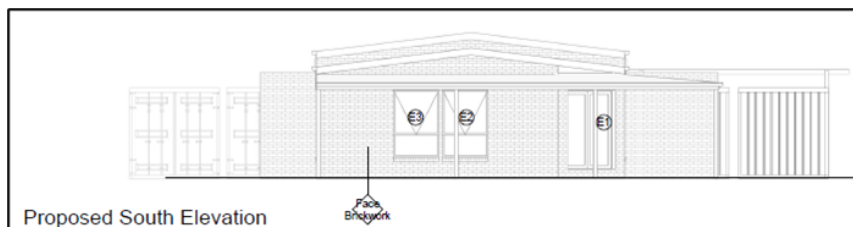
Proposed South Elevation, as viewed from Mt Buller Road
